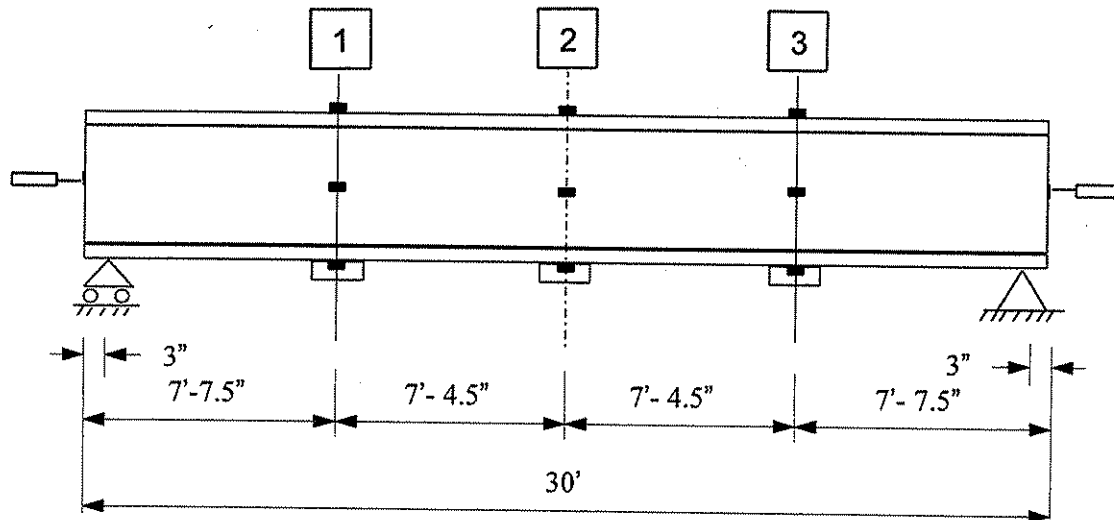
Loading apparatus used for testing the BISB two-beam specimen.
